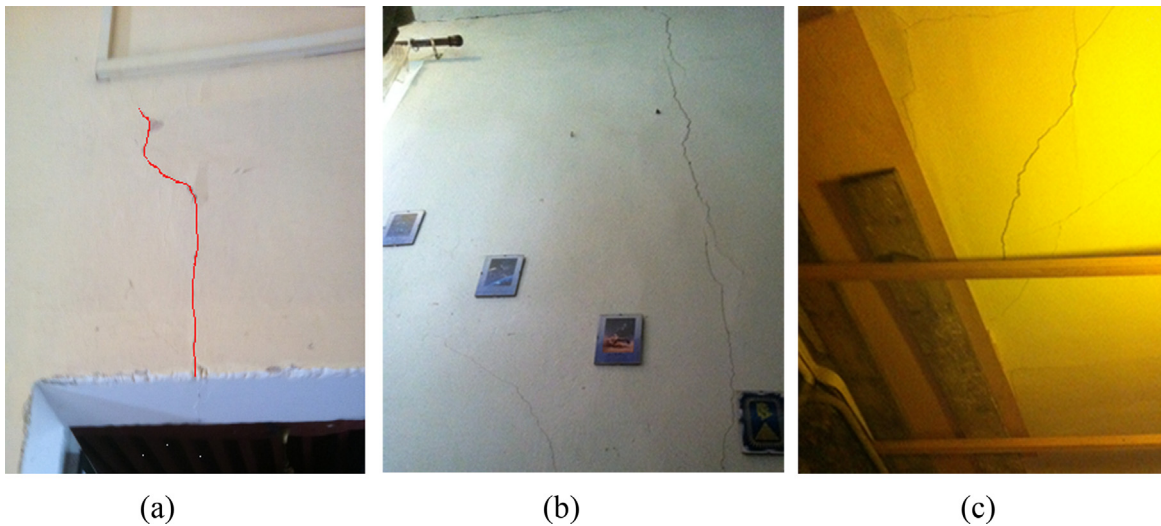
Crack above door (a), vertical cracks into a wall (b) and propping of a damaged ceiling (c).
